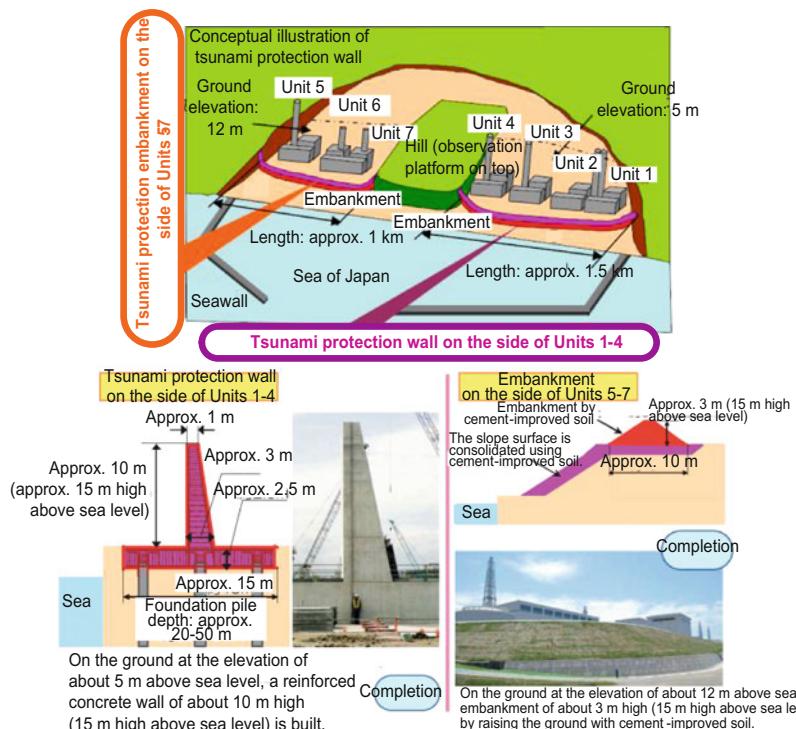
Prevention of the flooding of a plant by wall and embankment [11]
